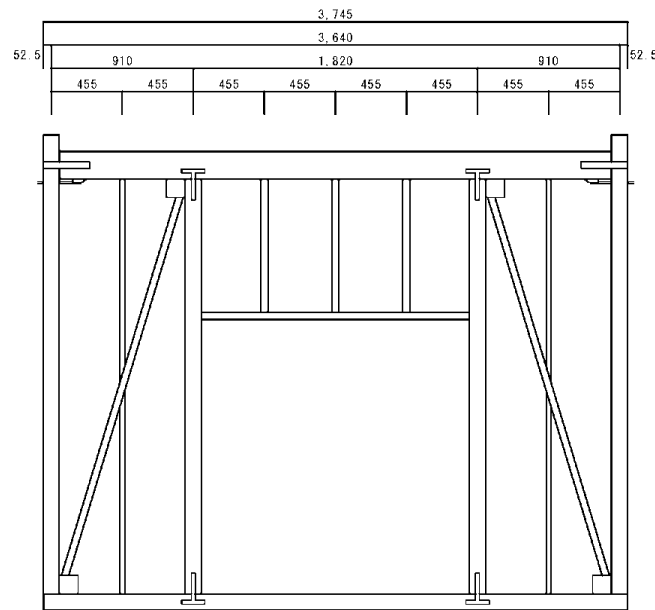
Elevation plan of conventional braces: Y-plane of a test structure for a small-scale shaking table test [1].
